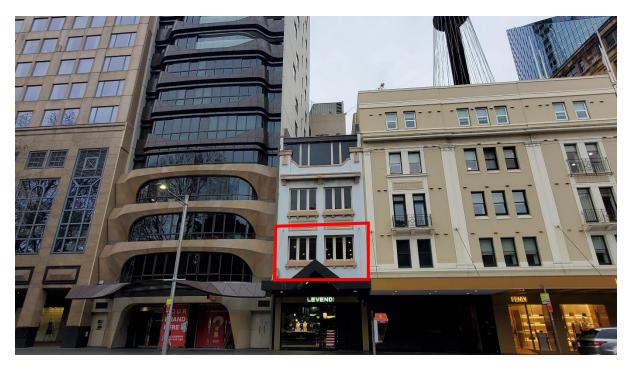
Portion of level one of the subject site which extends to Elizabeth Street shown with 141-143 Elizabeth Street directly to the left and 135-137C Elizabeth Street directly to the right
